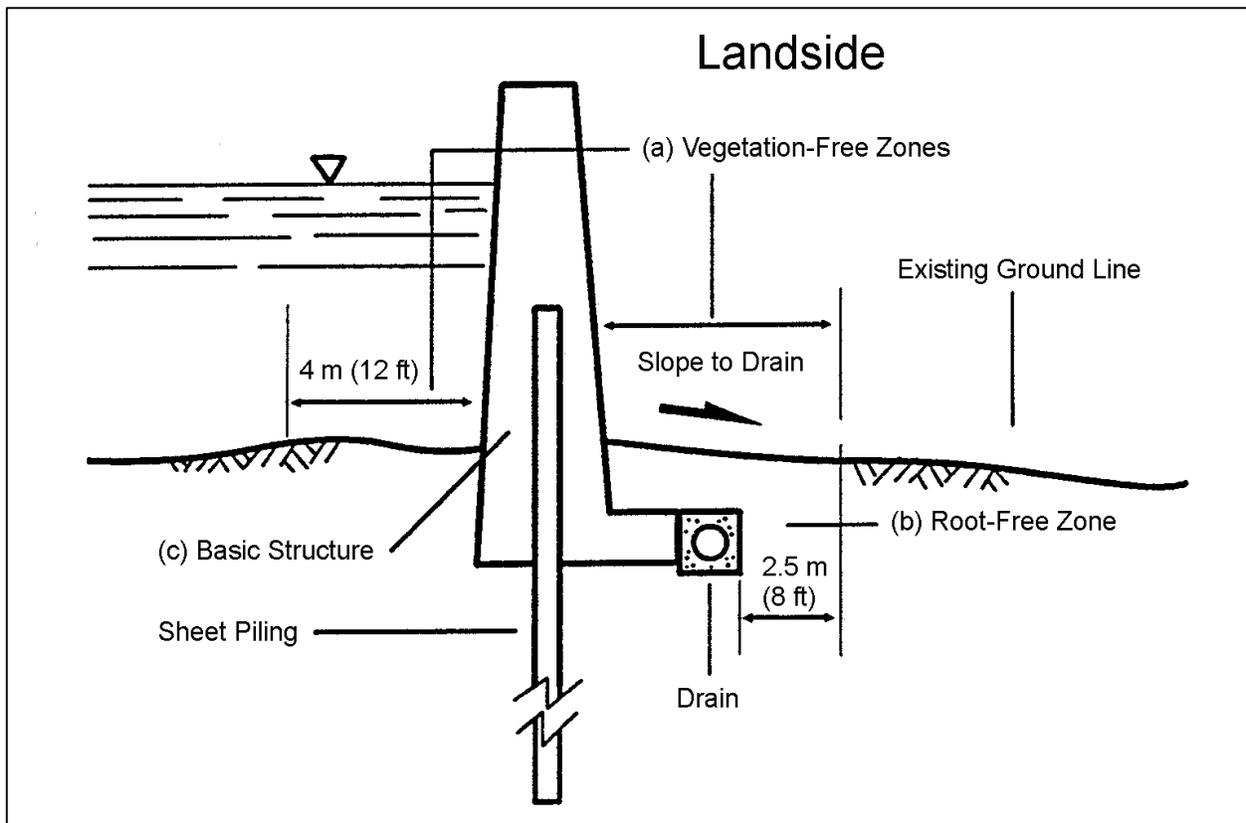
Cantilever I-type sheet piling floodwall showing (a) vegetation-free zone, (b) root-free zone (vertical joint occurring at section), and (c) basic structure
